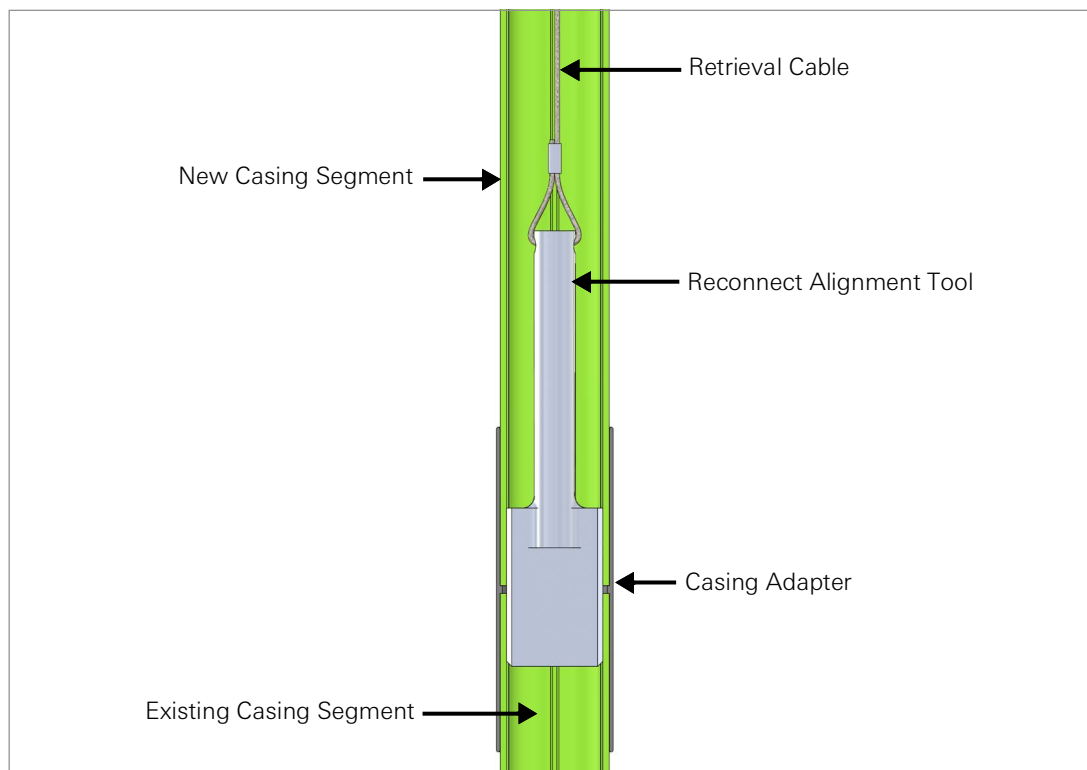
Repairing Casing Using the Casing Adapter and Reconnect Alignment Tool
